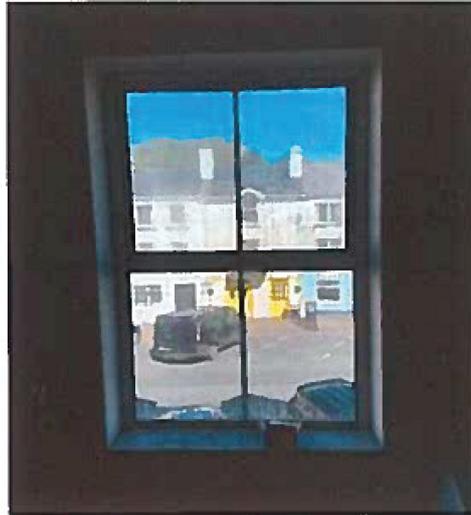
Window on first floor level. (Not working on day of inspection)
